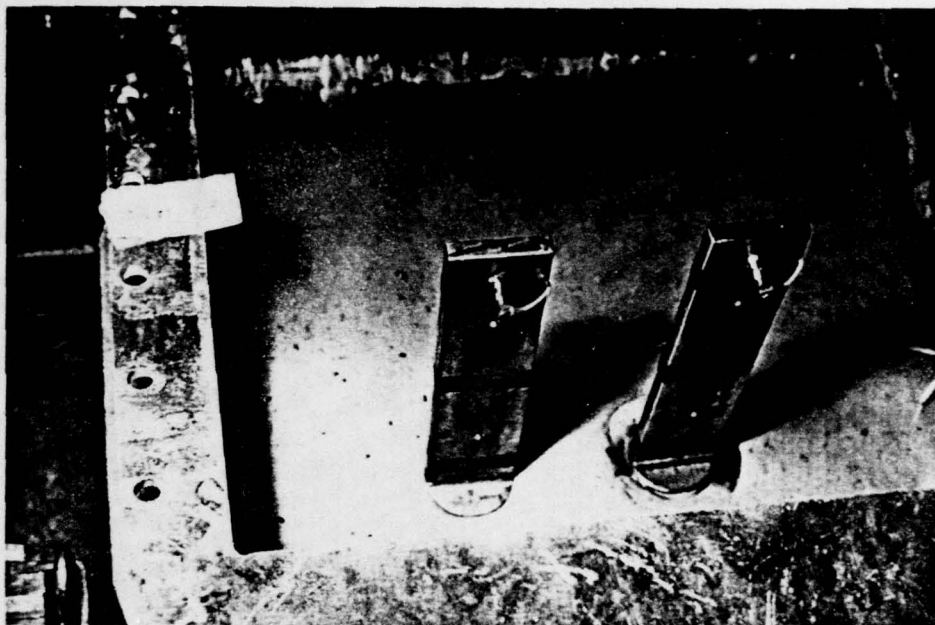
Towers on wet sand, before foundation failure
